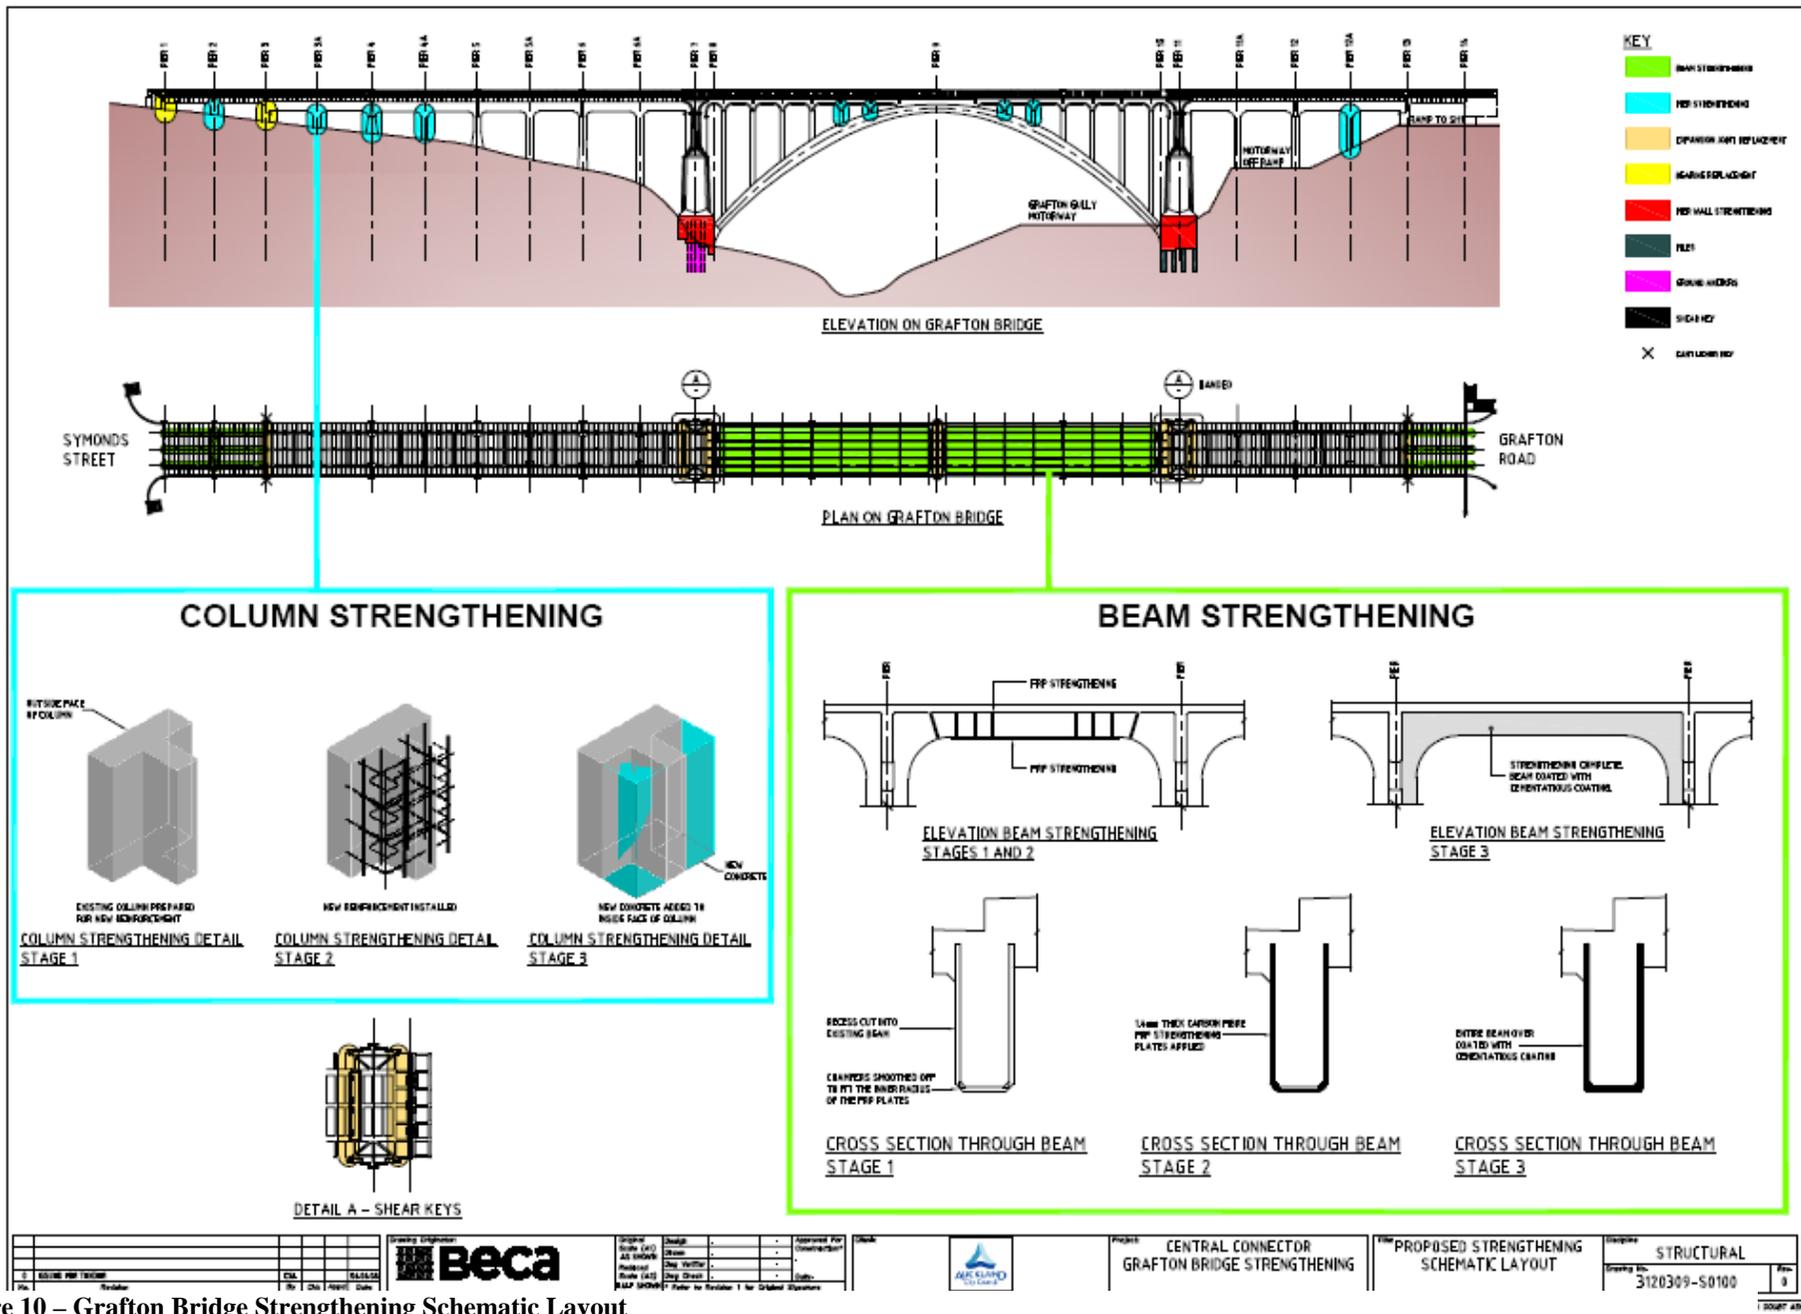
Grafton Bridge Strengthening Schematic Layout
